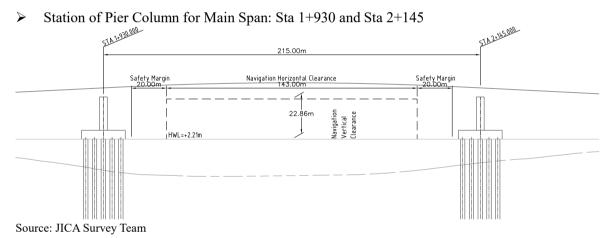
Cross Section for Navigable Waterway and Pier Column for Main Span
